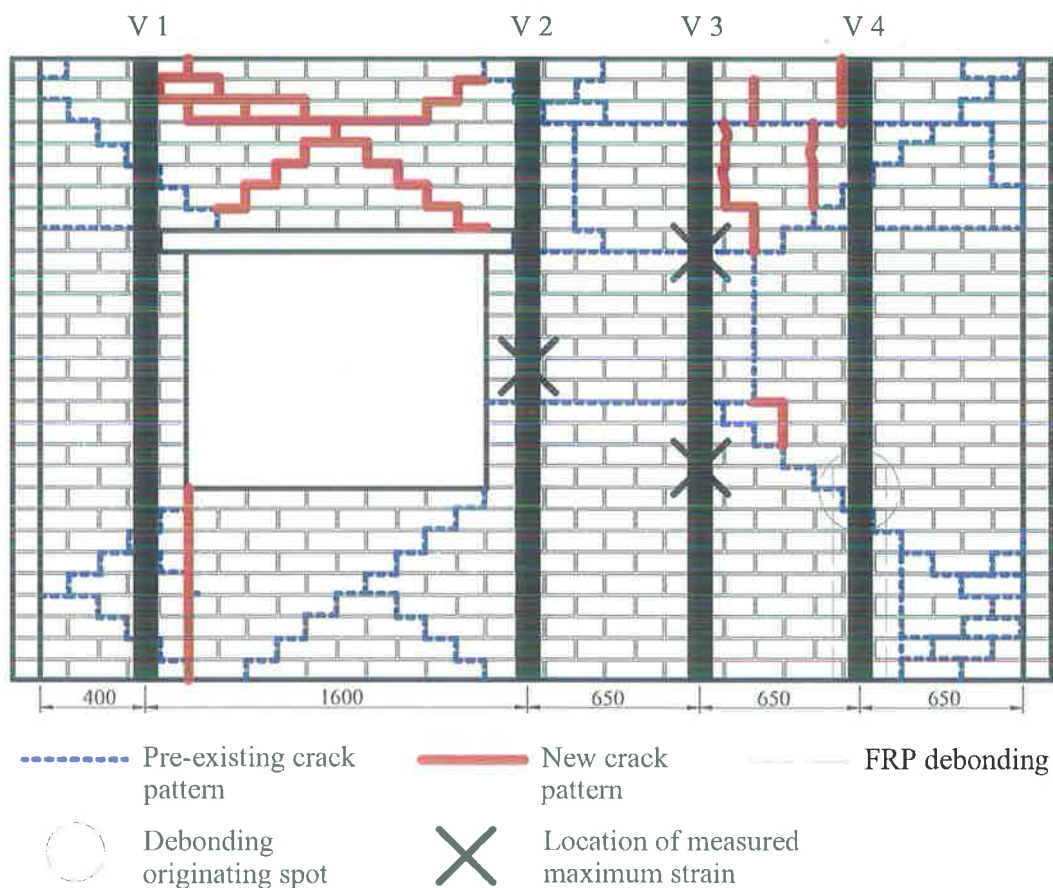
Schematic of cracking pattern and FRP debonding of Wall 1
